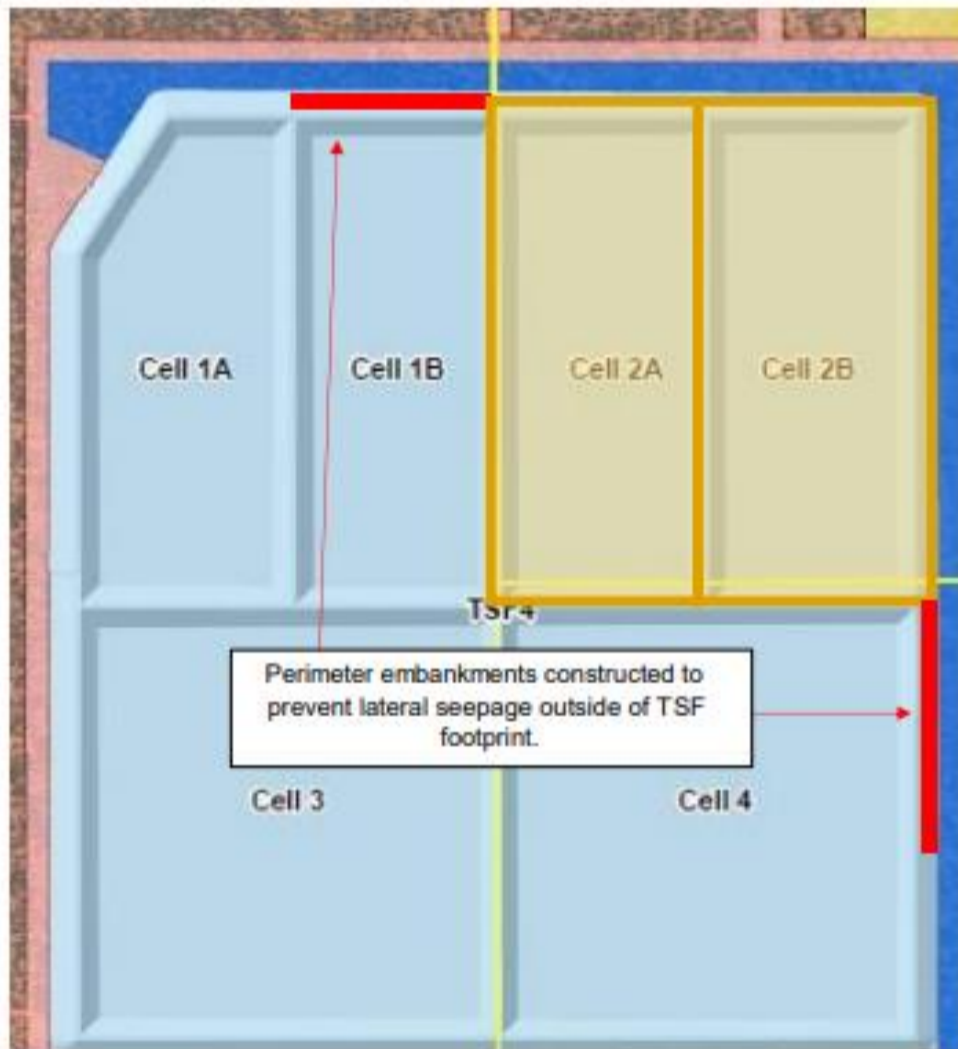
Plan showing Stage 2 of the TSF construction – Cell 2A construction
